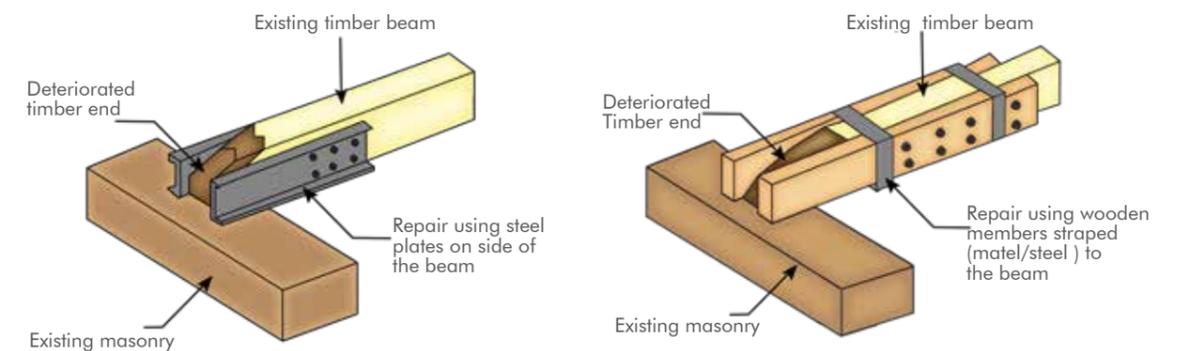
Reinforcing the rotten timber end with side plates and timber members using metal/steel straps, Source: Repair and Strengthening of Traditional Timber Roof and Floor Structures, 2018
